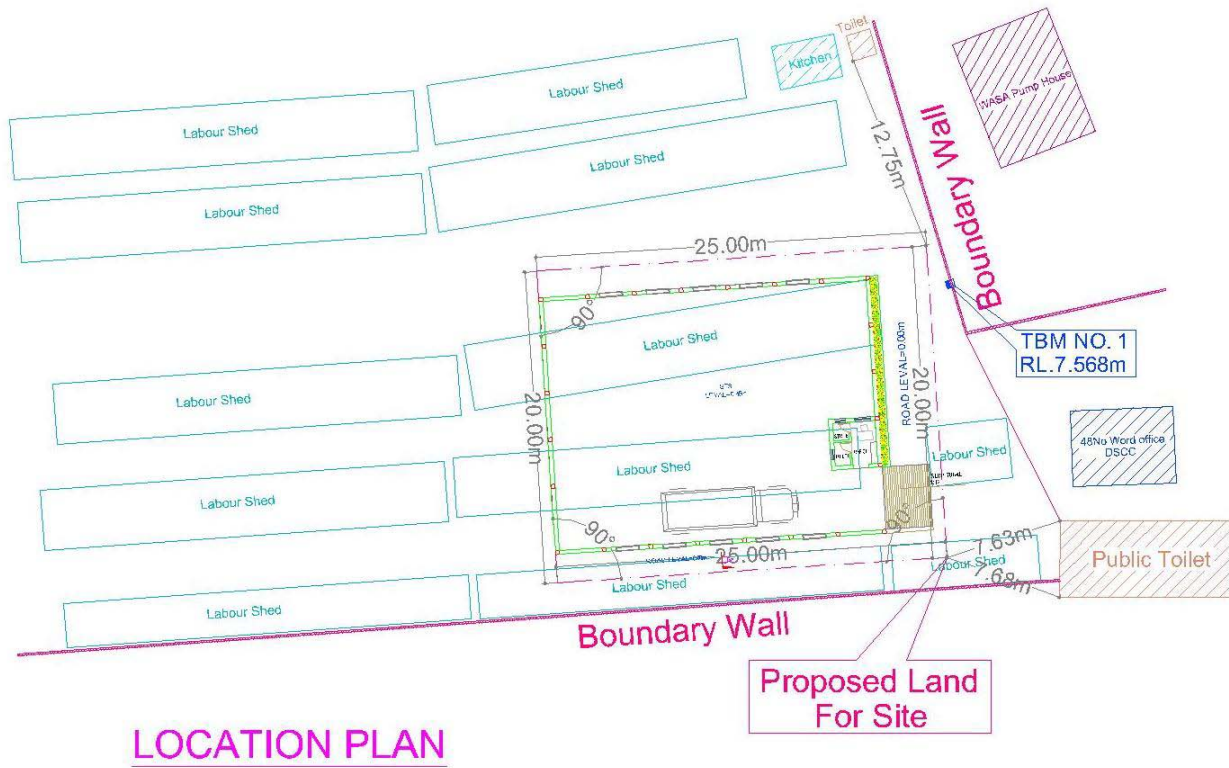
STS – 10 Jatrabari Crossing Layout Plan (23°42'38"N, 90°26'6"E)
